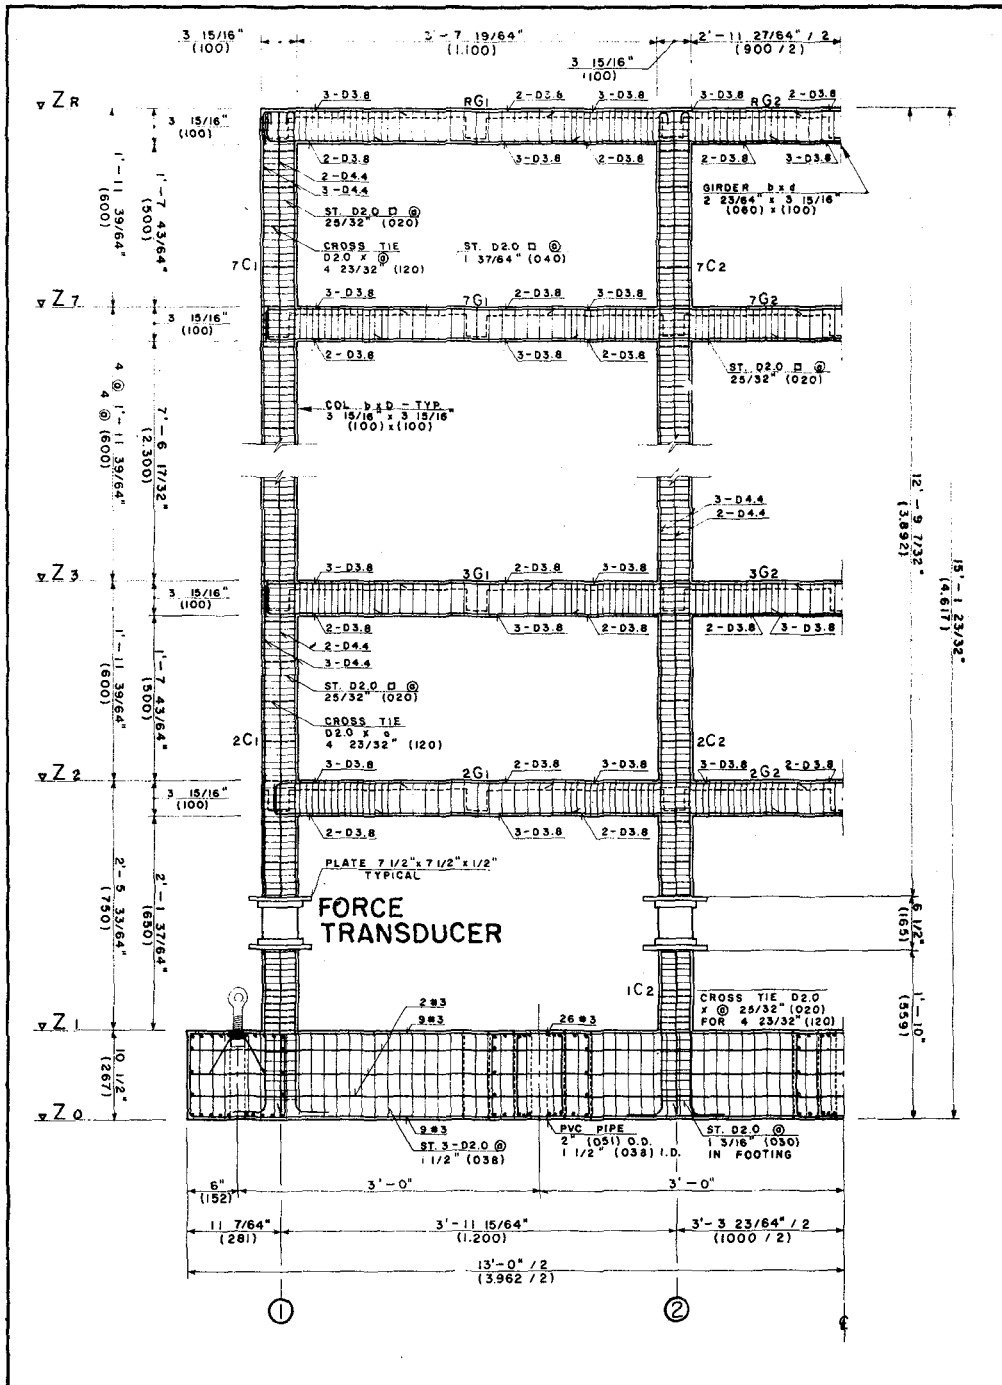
(b) TYPICAL DETAILING OF EXTERIOR FRAMES A AND C OF 1/5-SCALE MODEL
